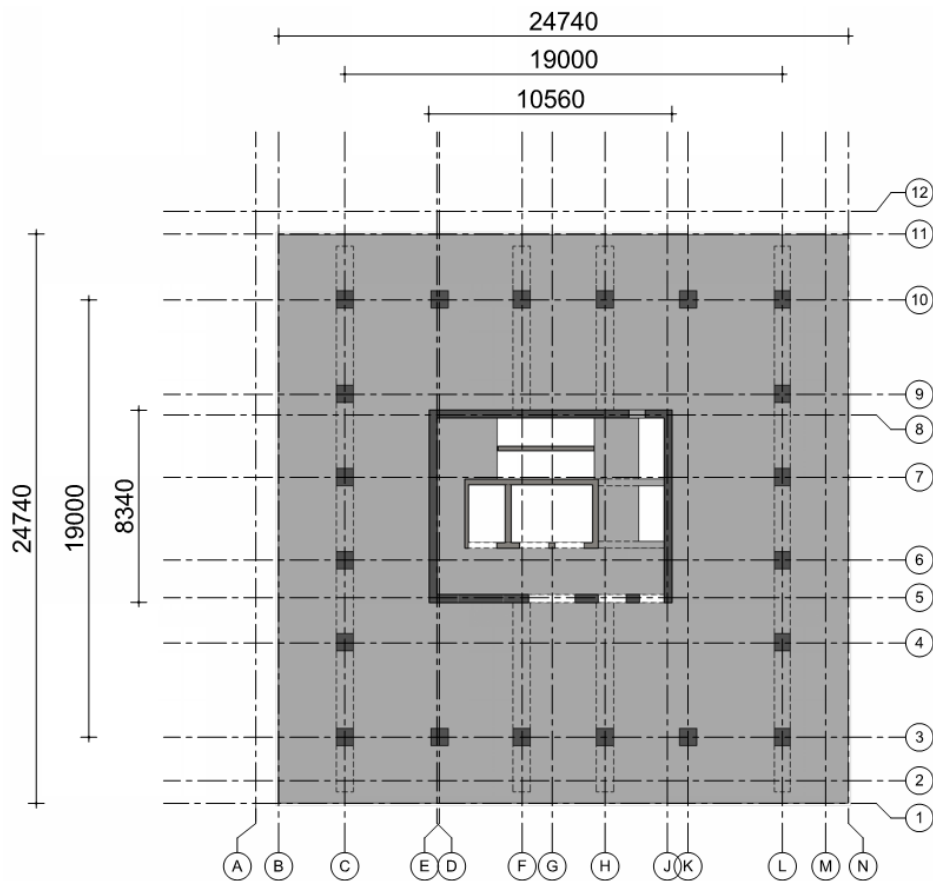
Floor plan of the first floor with columns and core as bearing structure.
